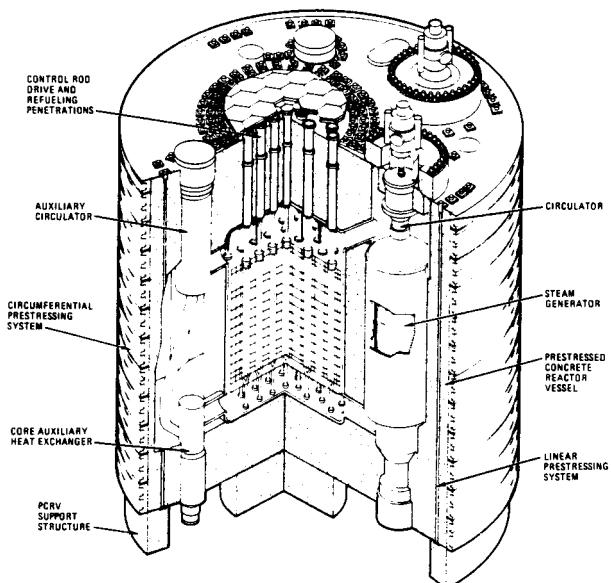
Cutaway view of HTGR nuclear steam supply system
